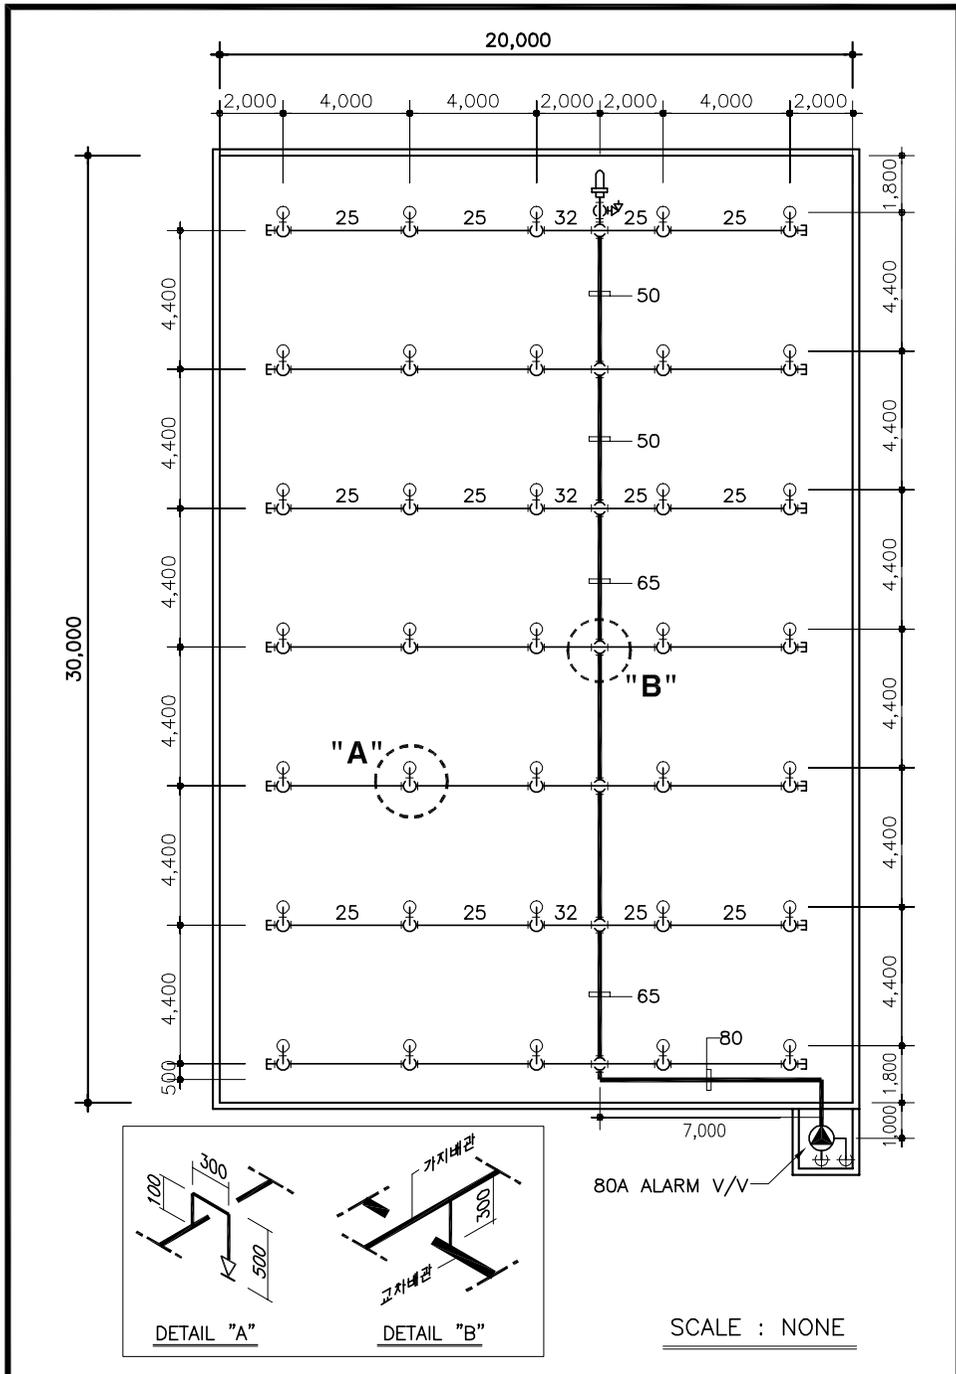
Plan View of Pipe Schedule Sprinkler System (Case "3", NFPA 13)
